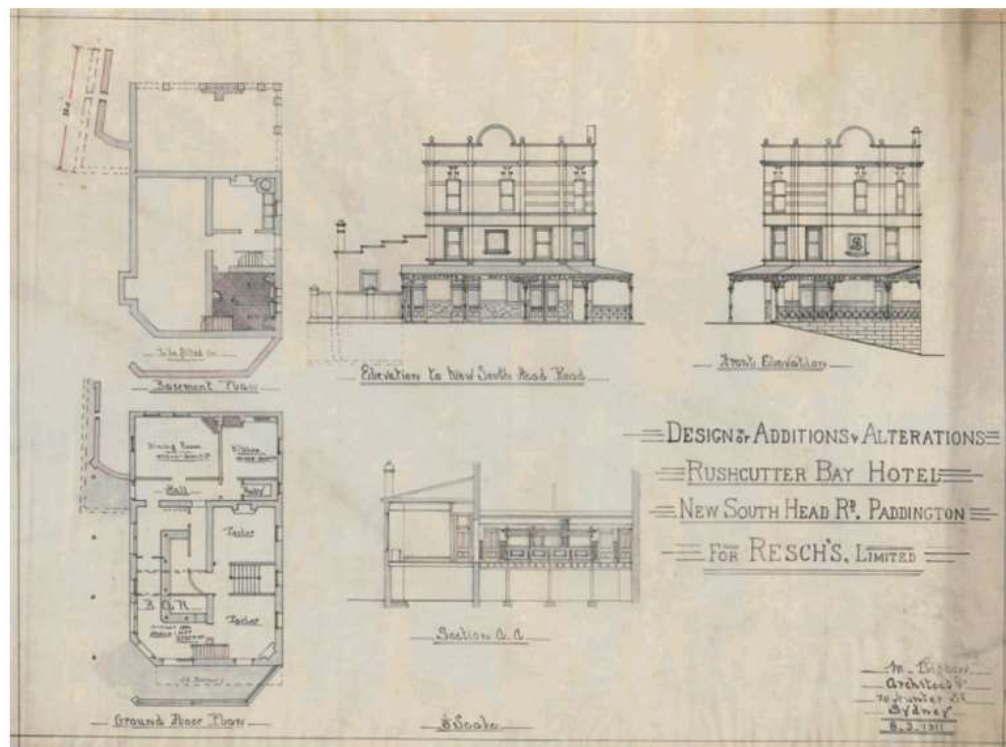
"Rushcutter [sic] Bay Hotel, New South Head Road, Paddington, Design of additions and alterations, basement and ground floor plan, front elevation, elevation to New South Head Road and section, Applicant/owner, Reschs Limited, Architect M Rigden, 70 Hunter Street, Sydney, Signed 30 March 1911". accessed via State Archives & Records https://www.records.nsw.gov.au/image/9590_62949
